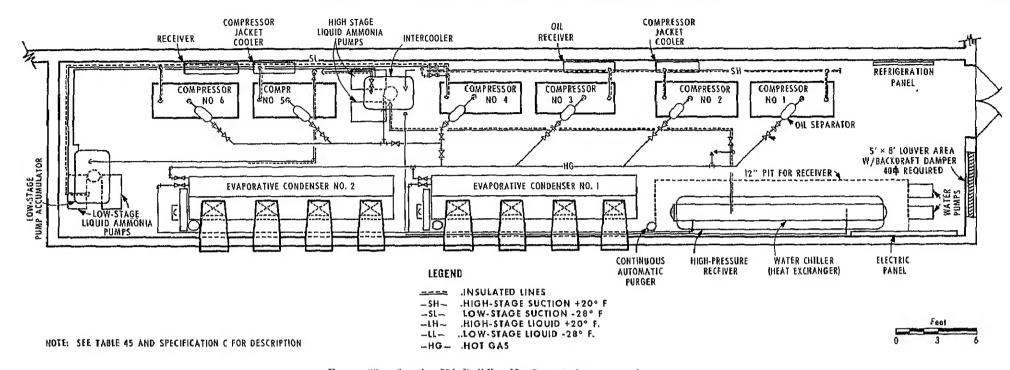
Situation III, Building No. 3, central system equipment room.
